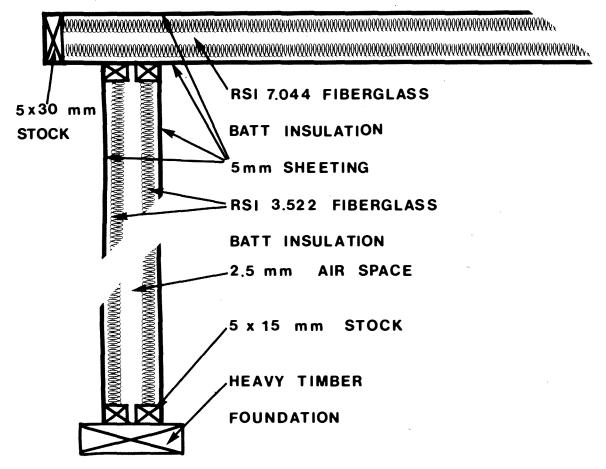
Cross section of the walls and ceiling showing the insulation and structural frame.
